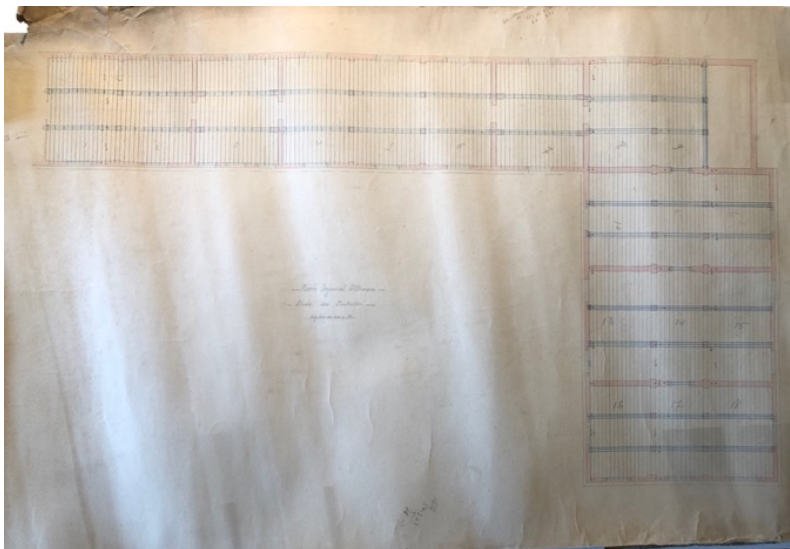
The iron profiles placements of Jack arched flooring system planned for 3rd Construction Phase of IAM (source: “IAM Archive, 98, G3/R3/9” (n.d.))
